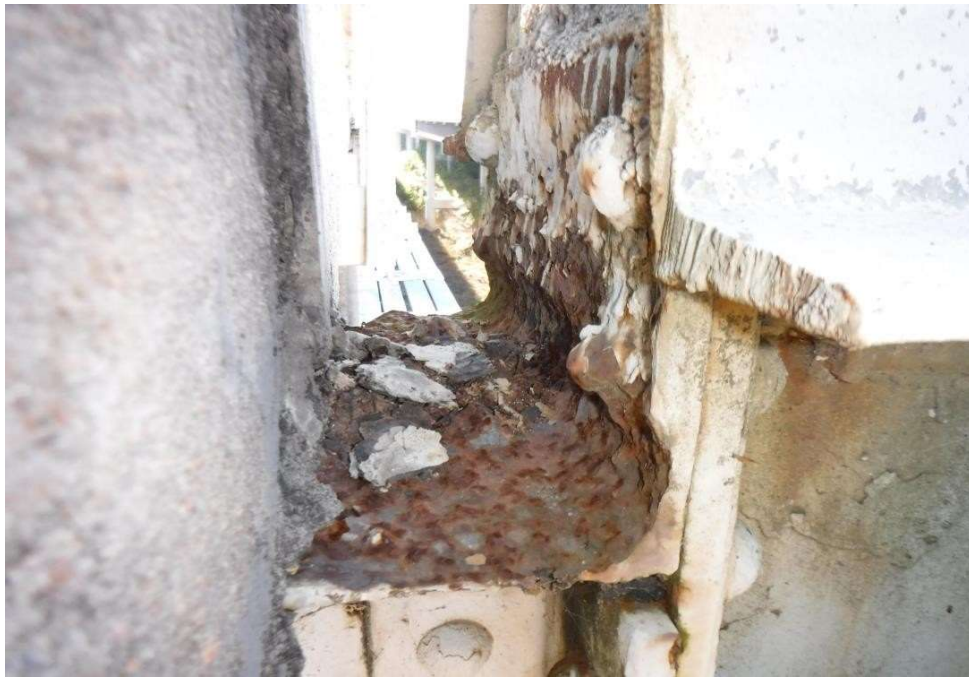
Floorbeam to vertical connection angle condition at Joint L3, Truss 2, Span 5
